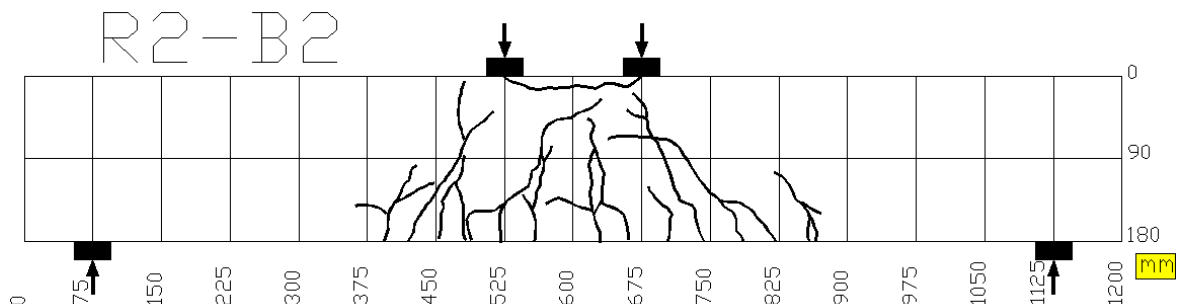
Crack Pattern for Beam (R2-B2) At Failure
